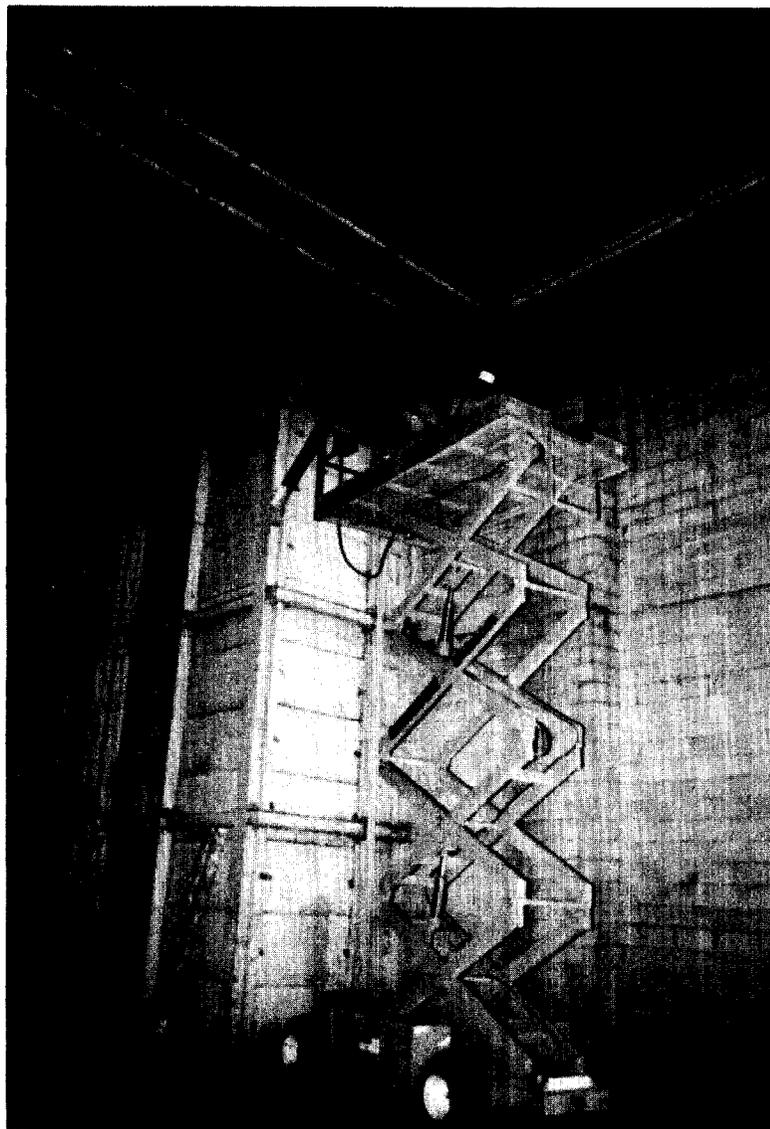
View looking west at scissors lift used to access top of shield wall and upper-level horizontal beams.
